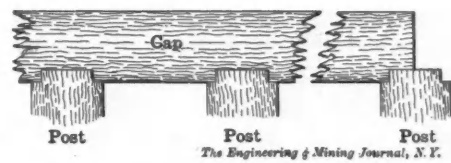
METHOD OF JOINING CAPS AND BOLTS
